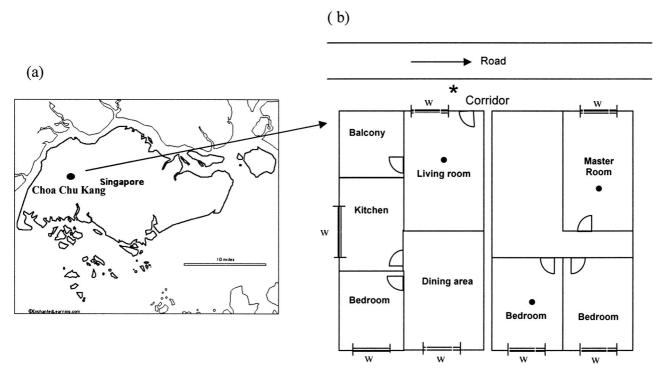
(a) Map of Singapore with (b) the floor plan of the sampling site at Choa Chu Kang. w = the windows in each of the rooms. Samples were taken from the rooms (living room, master bedroom, and bedroom), identified by ●, and outdoor sampling location identified by ∗.
